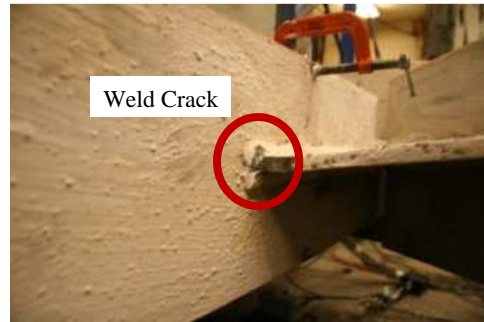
New Tear in South Gusset-to-Beam Weld
